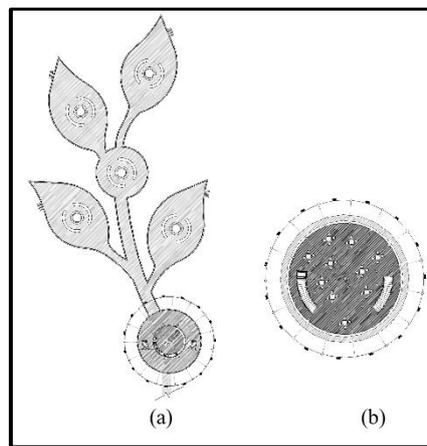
(a) 1st Floorplan of Pier; (b) 2nd Floorplan of Pier
